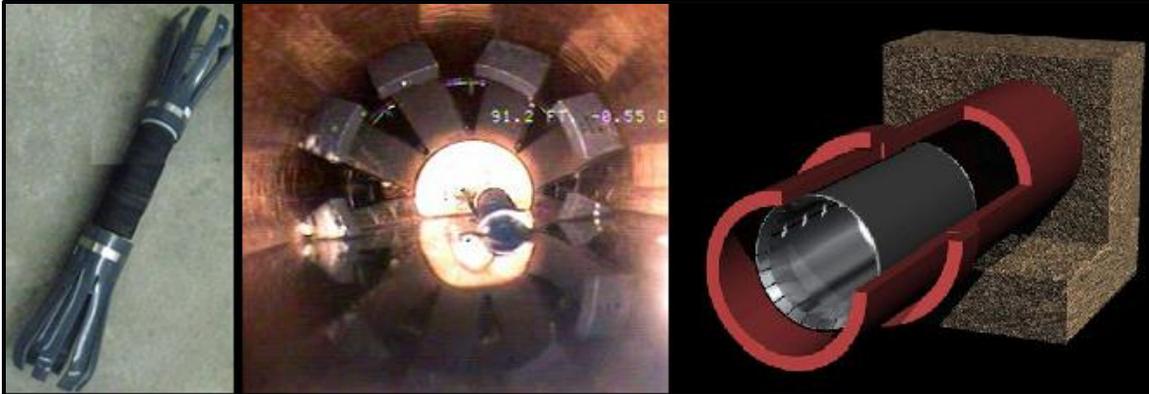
Internal Mechanical Sleeve (Link-Pipe, 2010)
